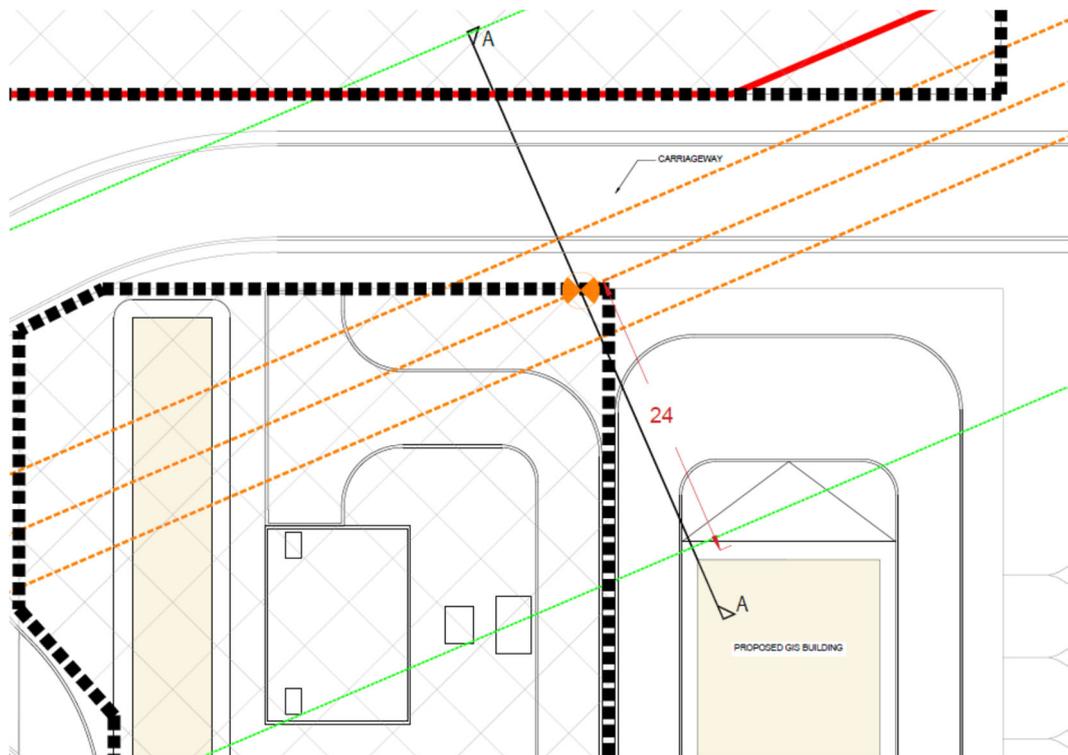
Extract of 110kV Overhead Line Clearances Drawing Solar Farms
